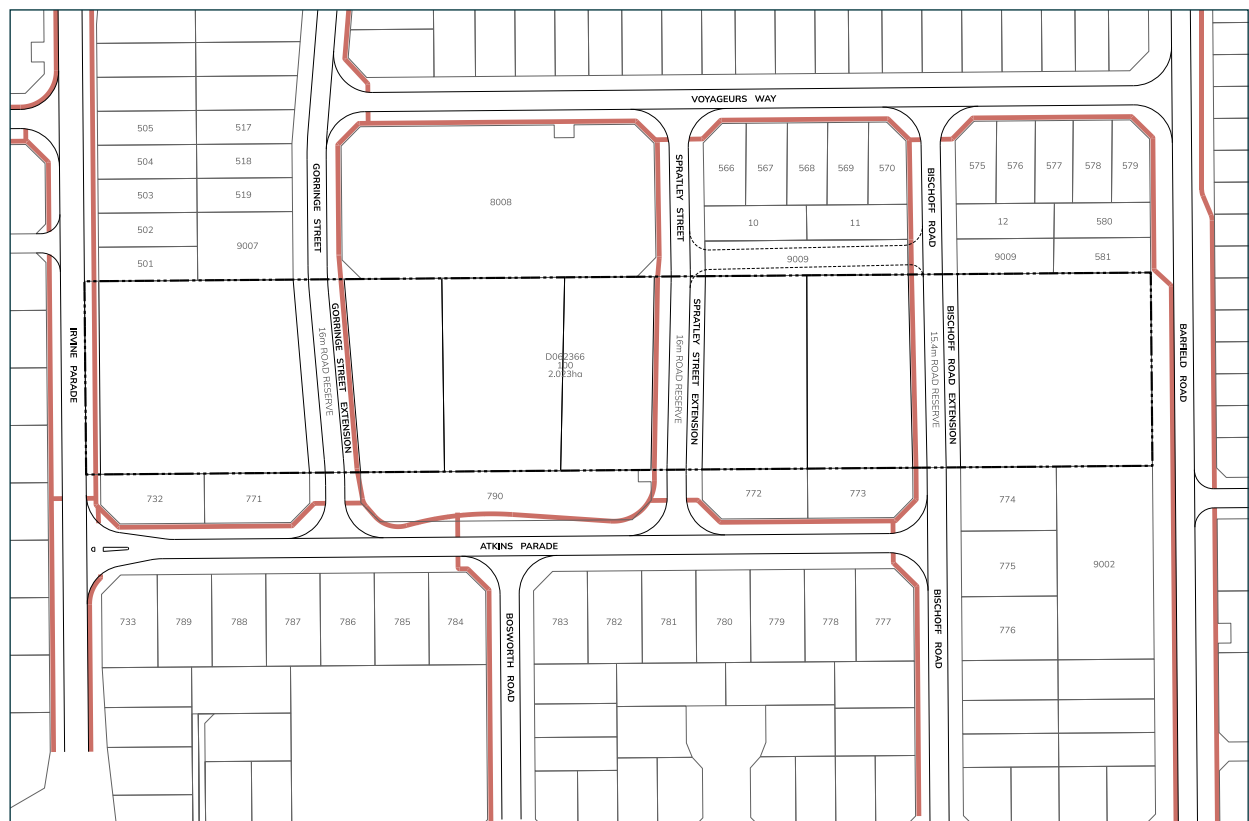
Proposed Connections to Existing Road and Pedestrian Network
